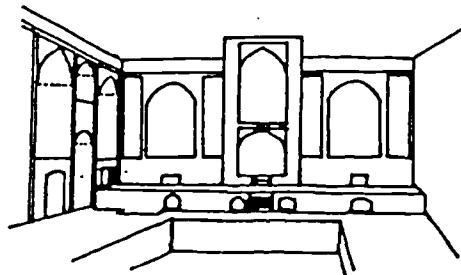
Reconstructed south elevation of the Immam Hussein house showing elevated central portico.
